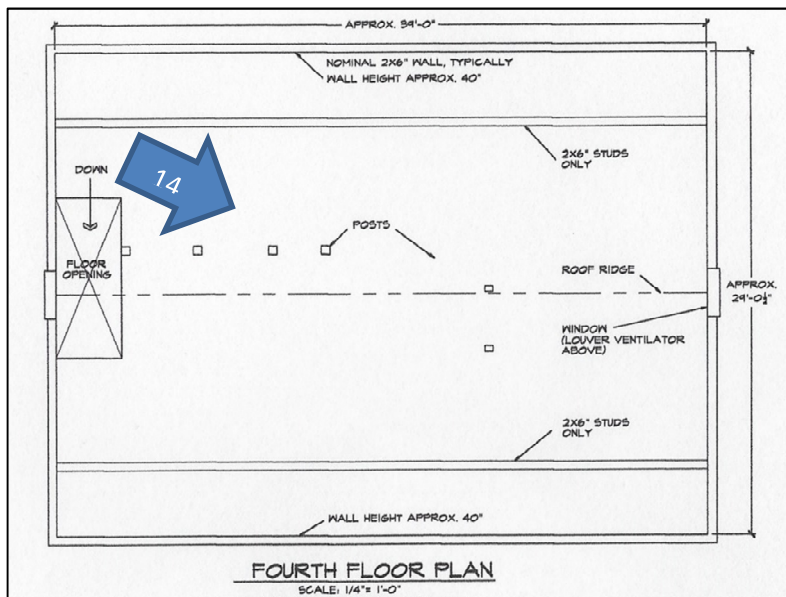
Keyed Attic Floor Plan of Reed Creek Mill.
